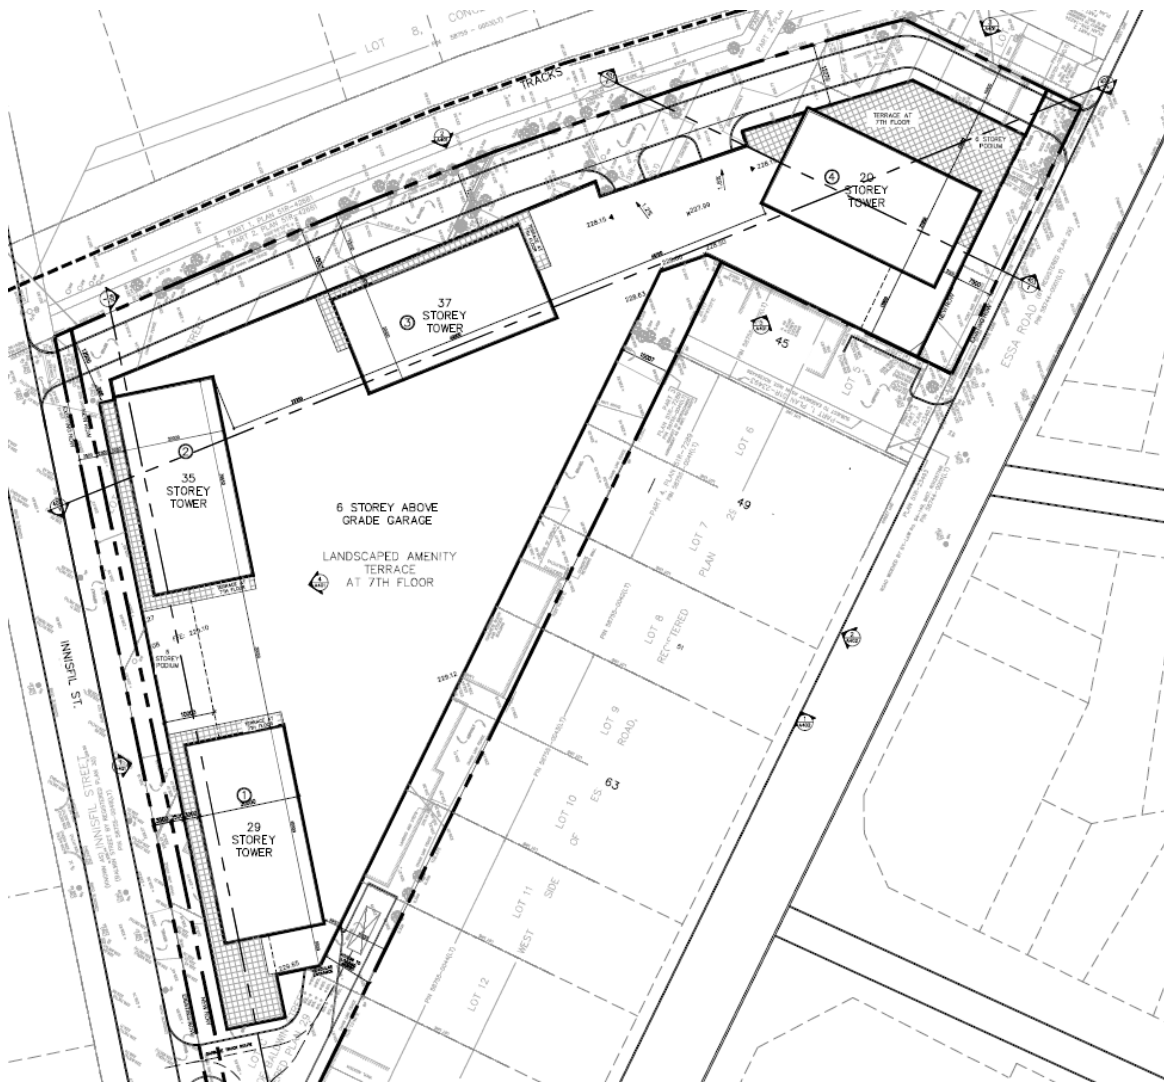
259 Innisfil St –Site Plan (Courtesy of architectural team – Mark Zwicker and Ihab Daakour)
